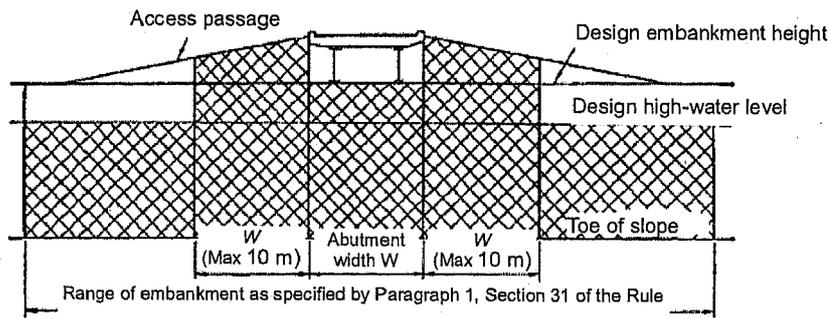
Height of a bank revetment required as a result of the installation of a bridge
